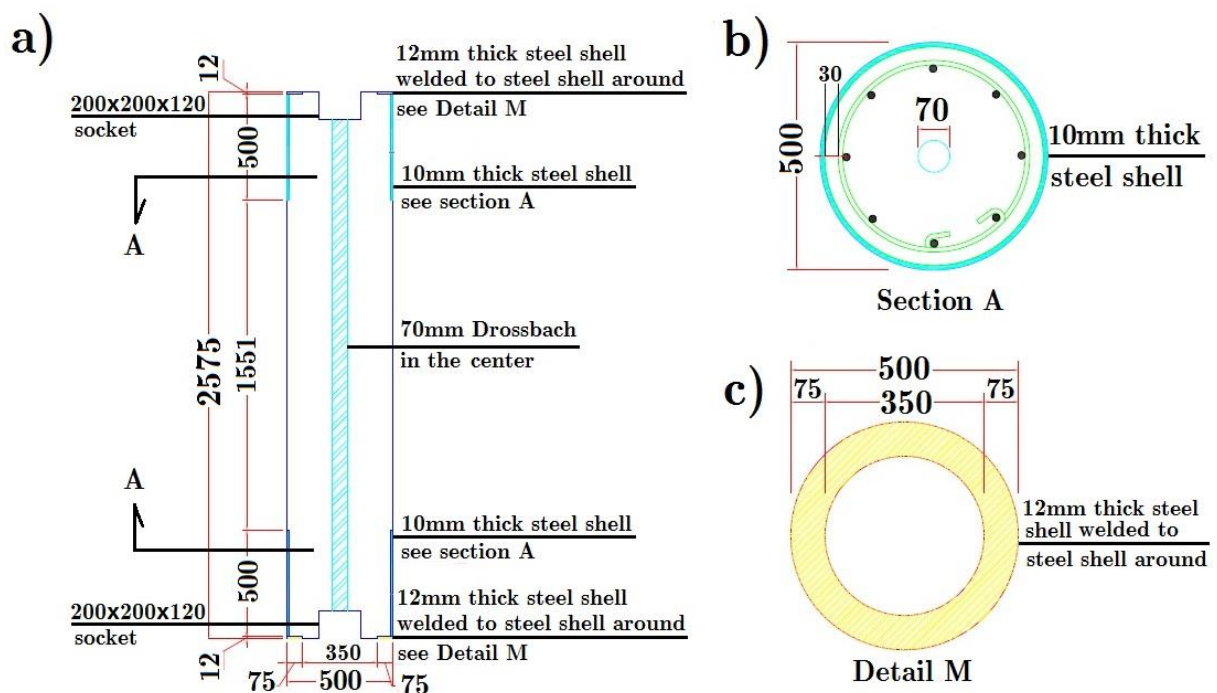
a) Overview of the rocking bridge pier, b) Details of cross-section at section A, c) Details of 12mm thick steel shell welded to 10mm thick steel shell around
